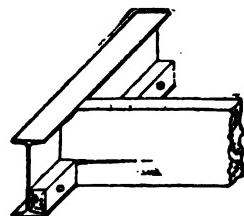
Framing Joist to I Beam with Wooden Cleat.
